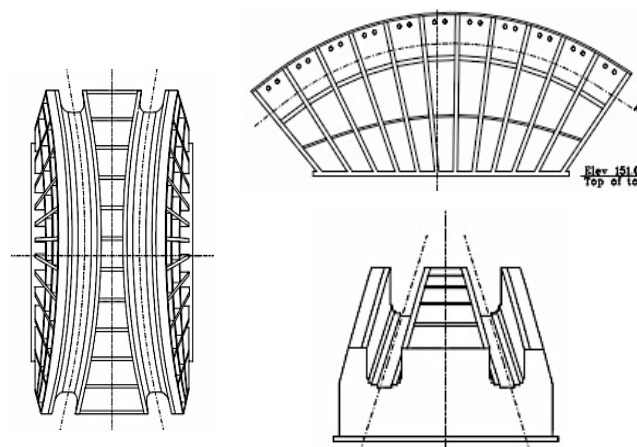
Plan, longitudinal and lateral views of the tower saddle (Ref.: Caltrans).
